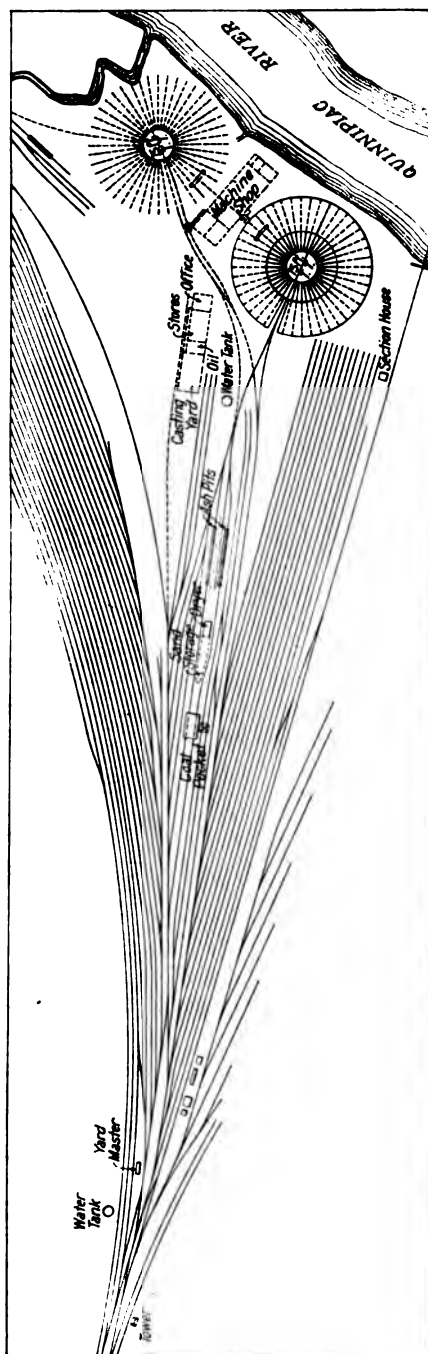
General plan of engine terminals, New Haven, Conn.—New Haven Road.
